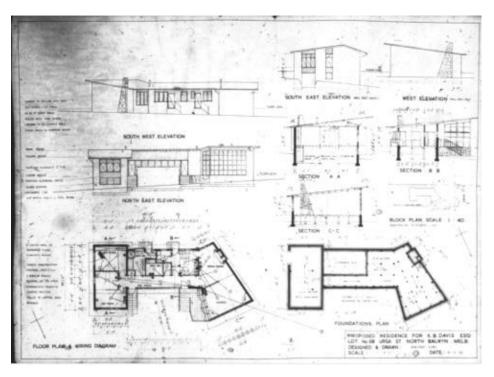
Working drawing sheet showing elevations, floorplan (electrical layout) and foundation plan prepared by Harcourt Long dated 6.8.1950 (Source: BP 57368)
